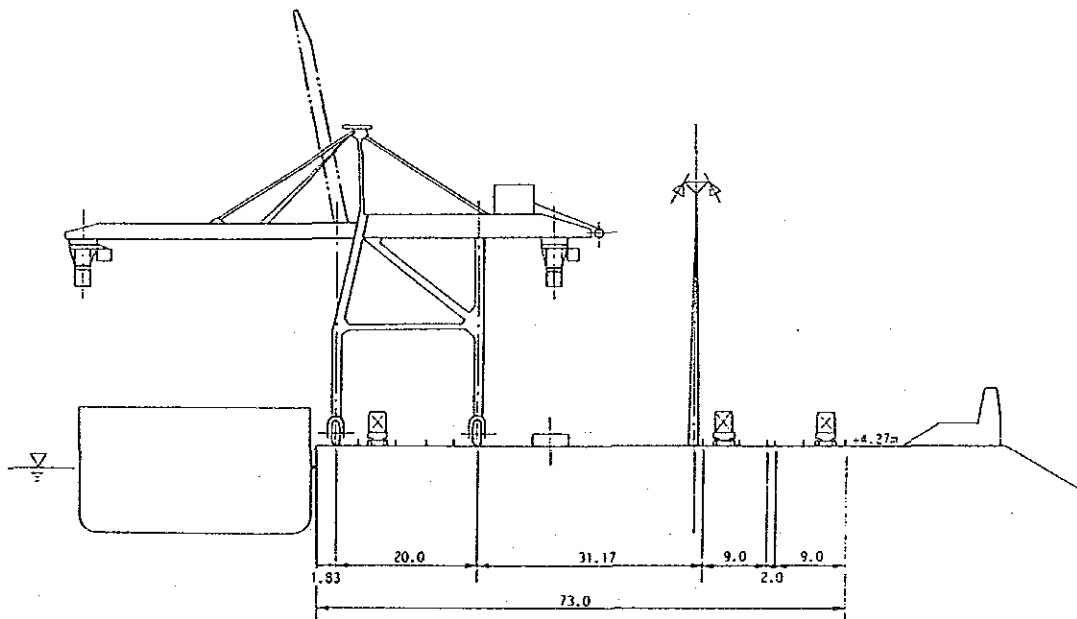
A Cross Section of No.1 & 1A Berth (Unit: m)
